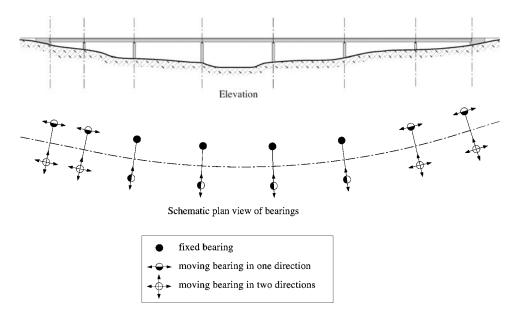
Example of fixed and moving bearings with their schematic representation for a bridge on flexible piers.
